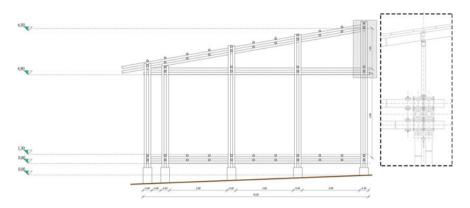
Design schemes to illustrate the structural system realized by modular bamboo elements with a special metal joint
